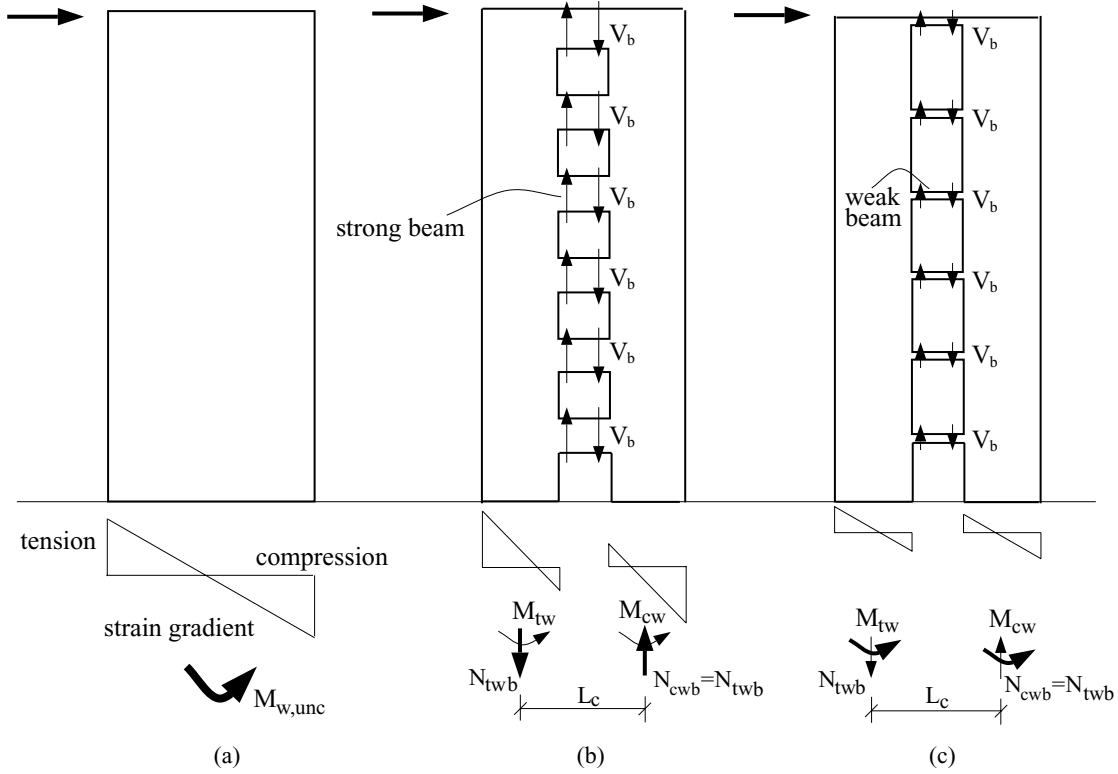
Lateral load resisting mechanisms in structural walls (adapted from Paulay and Priestley 1992): (a) uncoupled wall; (b) walls coupled with strong beams; (c) walls coupled with weak beams
